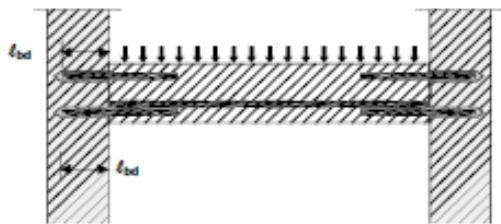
End anchoring of slabs or beams, designed as simply supported
